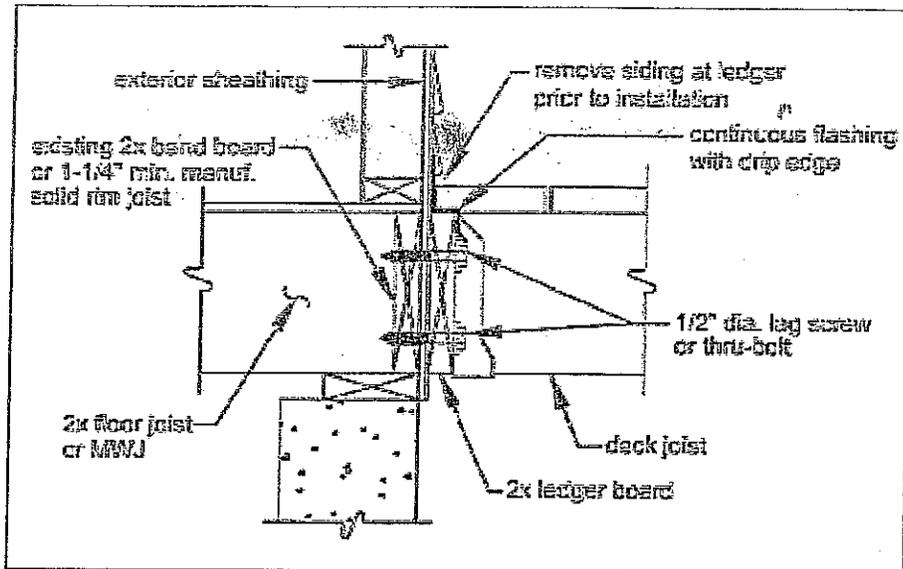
ATTACHMENT OF LEDGER BOARD-TO-BAND BOARD
